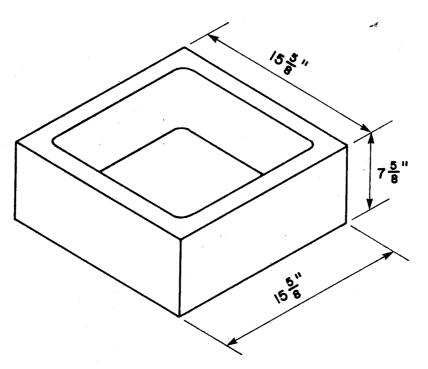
SPECIAL CONCRETE MASONRY UNIT
